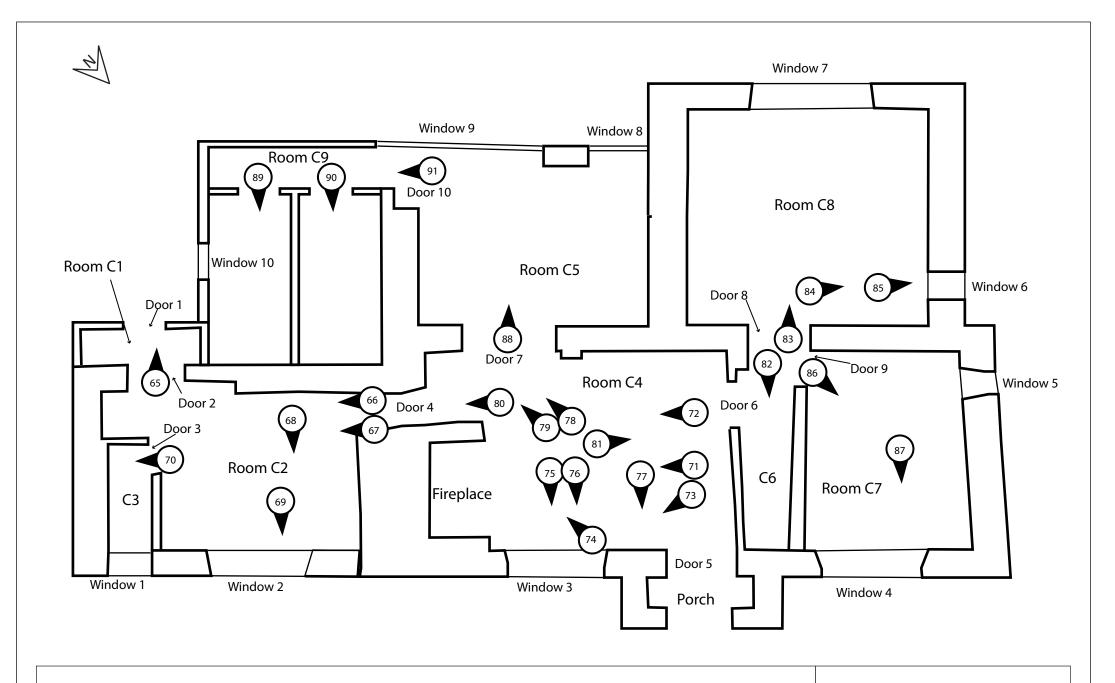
Photographic location plan of the interior of the Cottage, Colwyn Bay.
